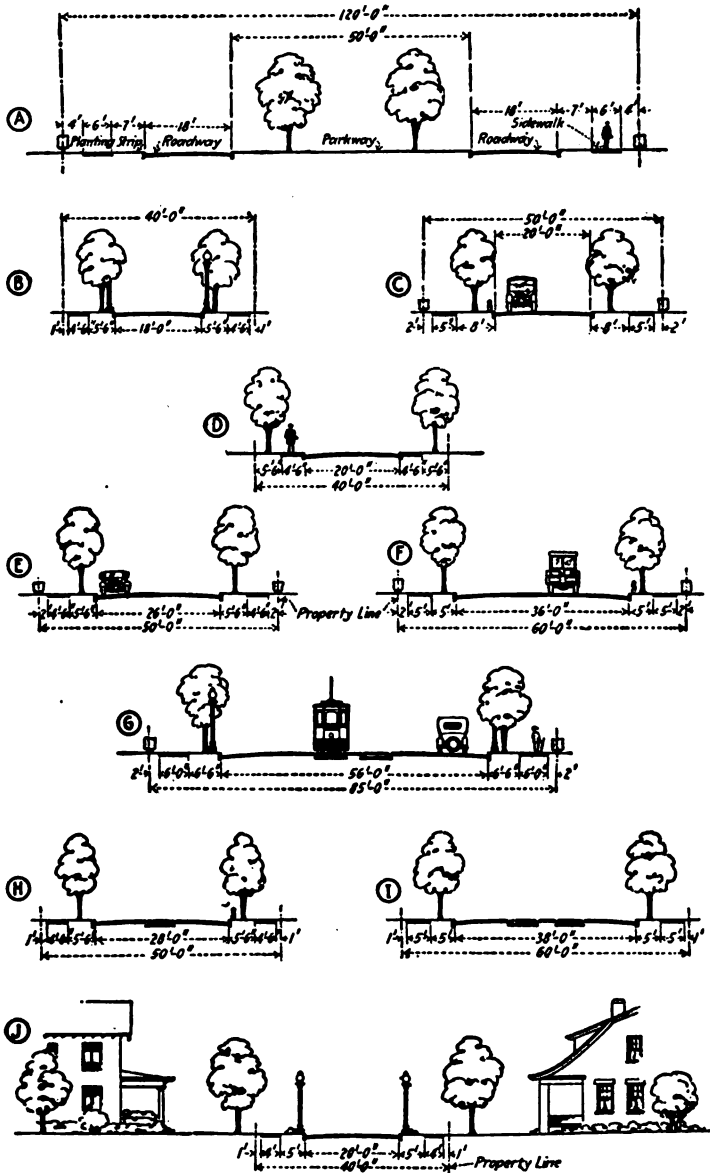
Typical and suggested examples in street subdivision. (A) A parkway in Yorkshipp Village. (B) 40-foot street with 18-foot roadway. (C) 50-foot street with 20-foot roadway. (D) 40-foot street with 20-foot roadway. (E) 50-foot street with 26-foot roadway. (F) 60-foot street with 36-foot roadway. (G) 85-foot street with 56-foot roadway designed for four lines of vehicular traffic and two street car tracks. (H) 50-foot street with 28-foot roadway and single track. (I) 60-foot street with double track. (J) Alternative design of 40-foot street with tree line set back of street line.
